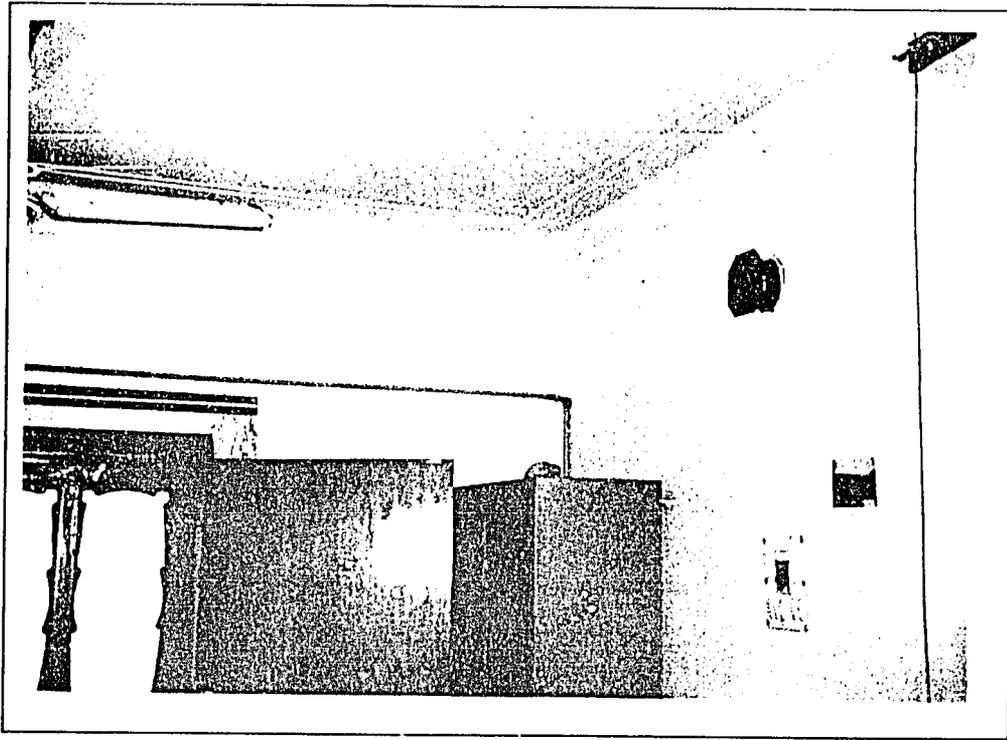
Quetta AID/REP Office Facility. Second floor, cable to be routed along conduit to VITA office.
